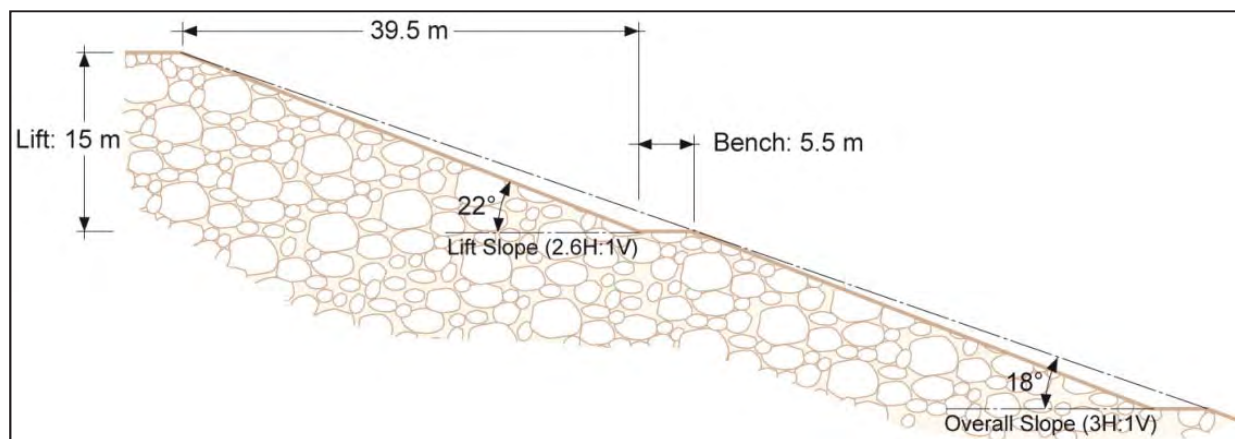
Typical Cross-Section of the Overburden Piles (by WSP)
